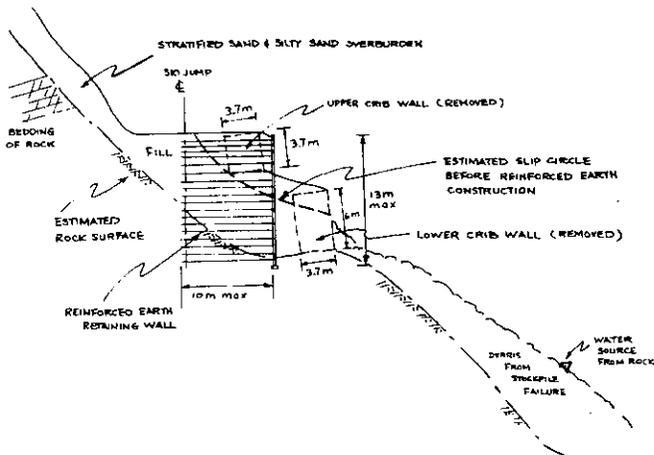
Cross section through jump shows relative positions of removed crib walls and reinforced earth wall.
